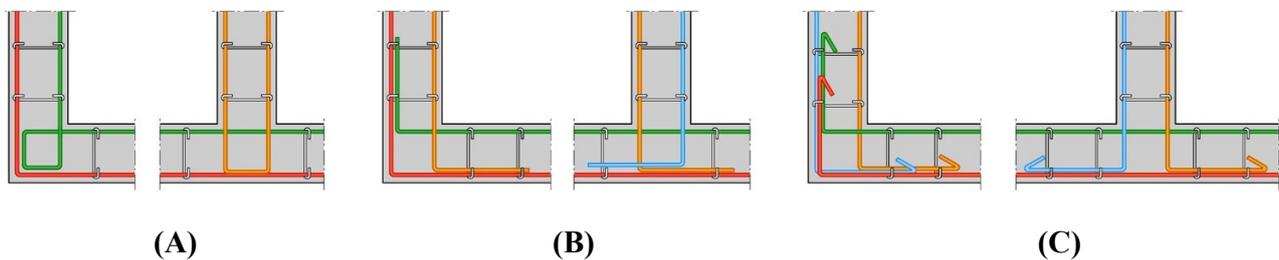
Principles of different steel reinforcement patterns in beams, following the recommendations made in (A) Arya et al (1980), (B) UNDP (2007), (C) Arya et al (2014). (all by courtesy of Smart Shelter Foundation).
